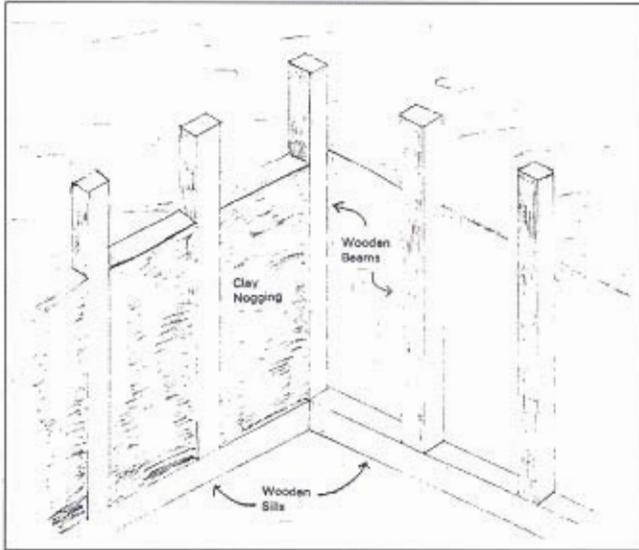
Proposed Reconstruction of the Foundations of the Dawson House
